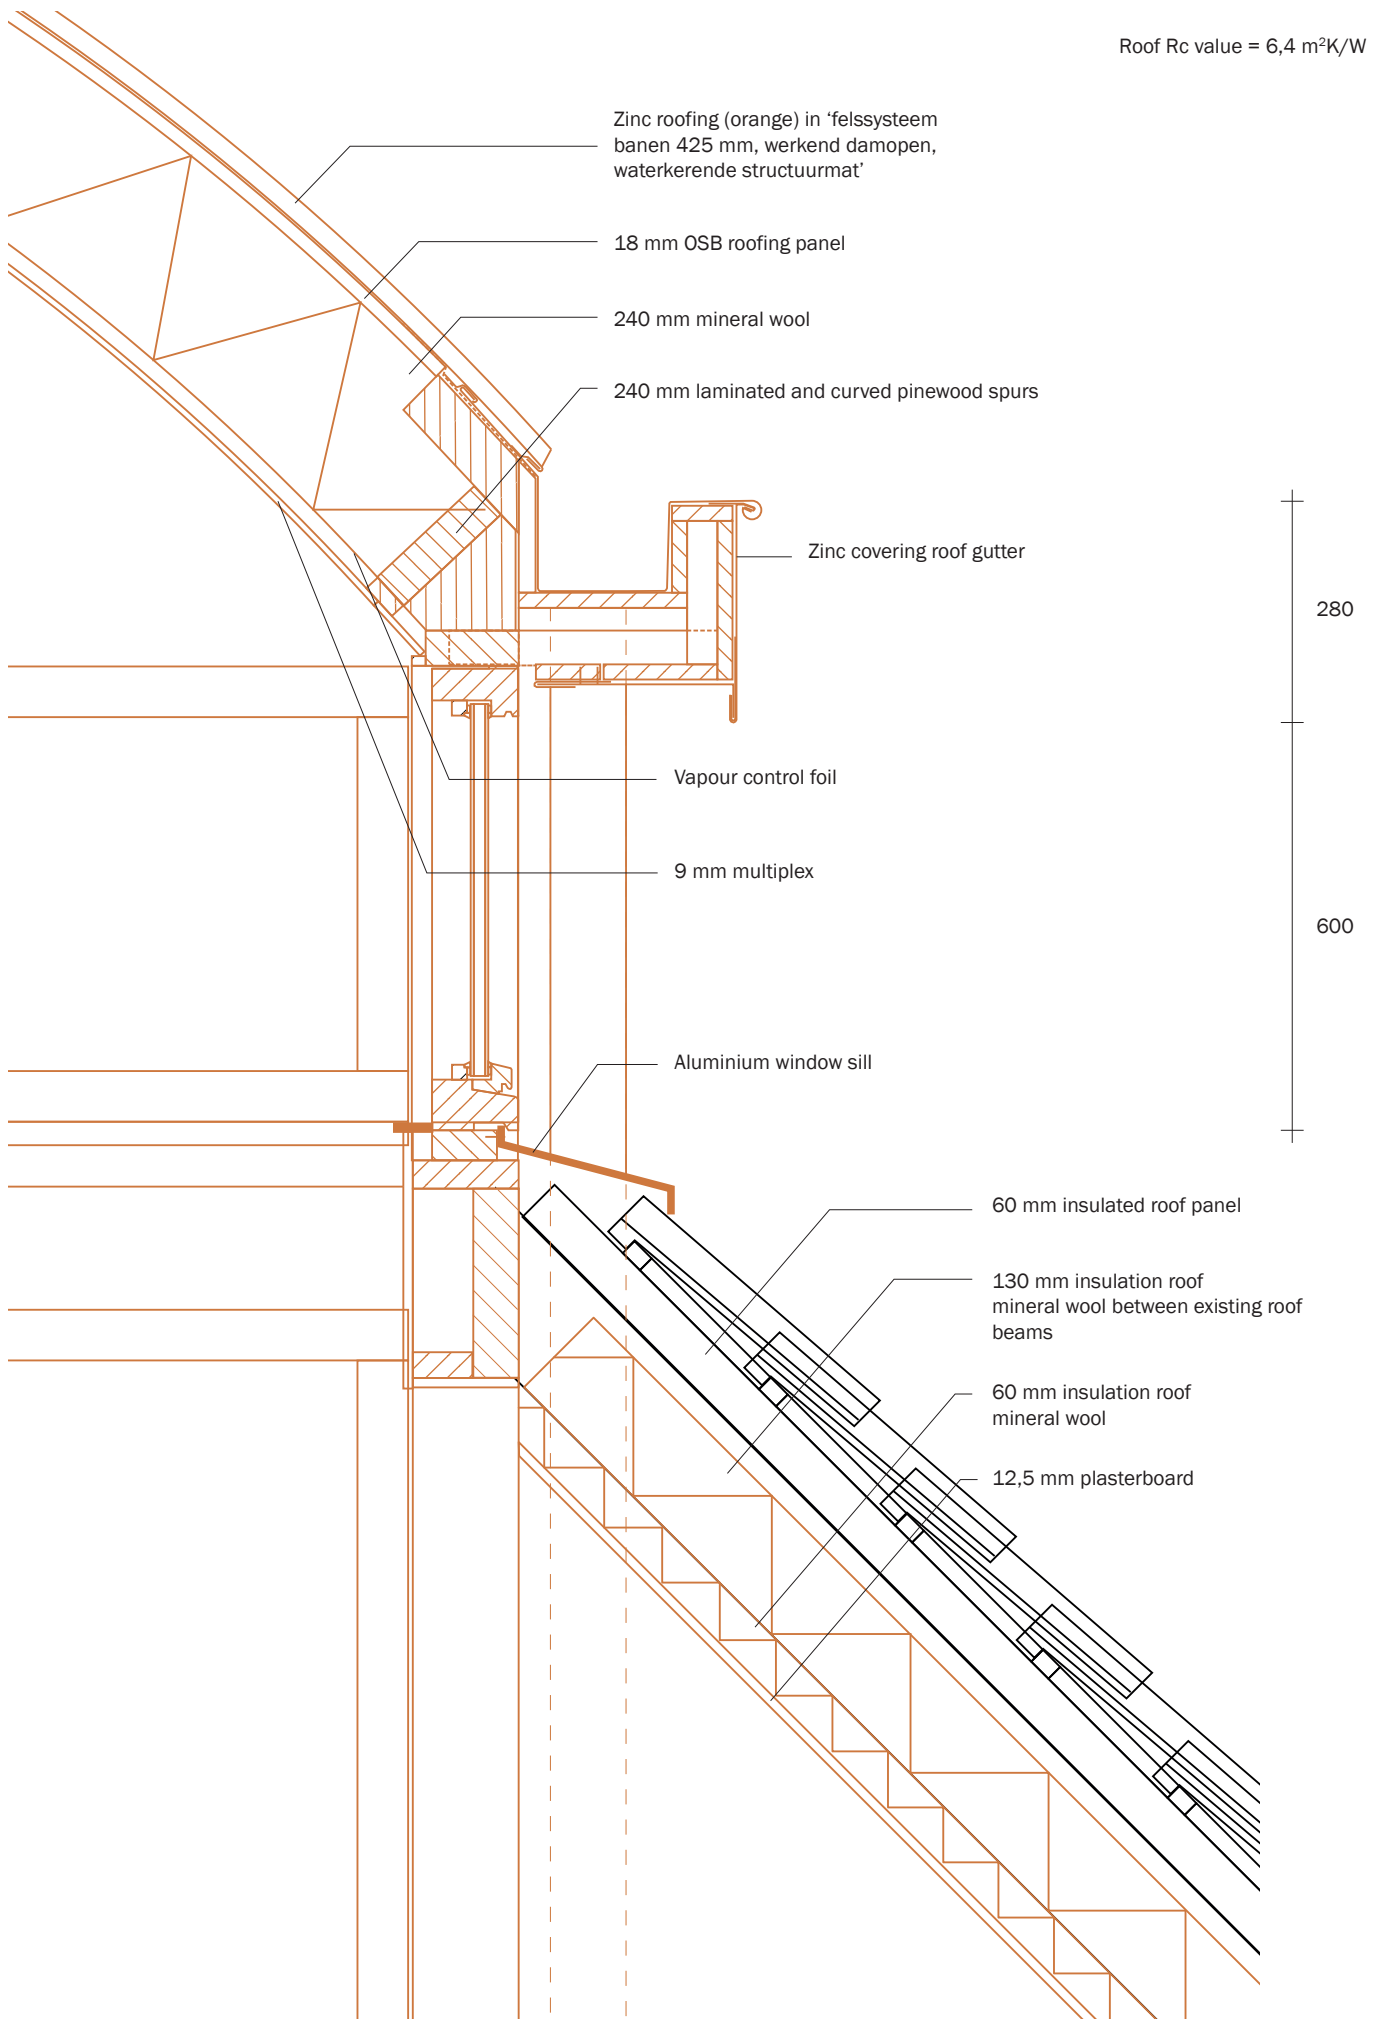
Detail D 'doorzonzolder' roof connection 1:10
